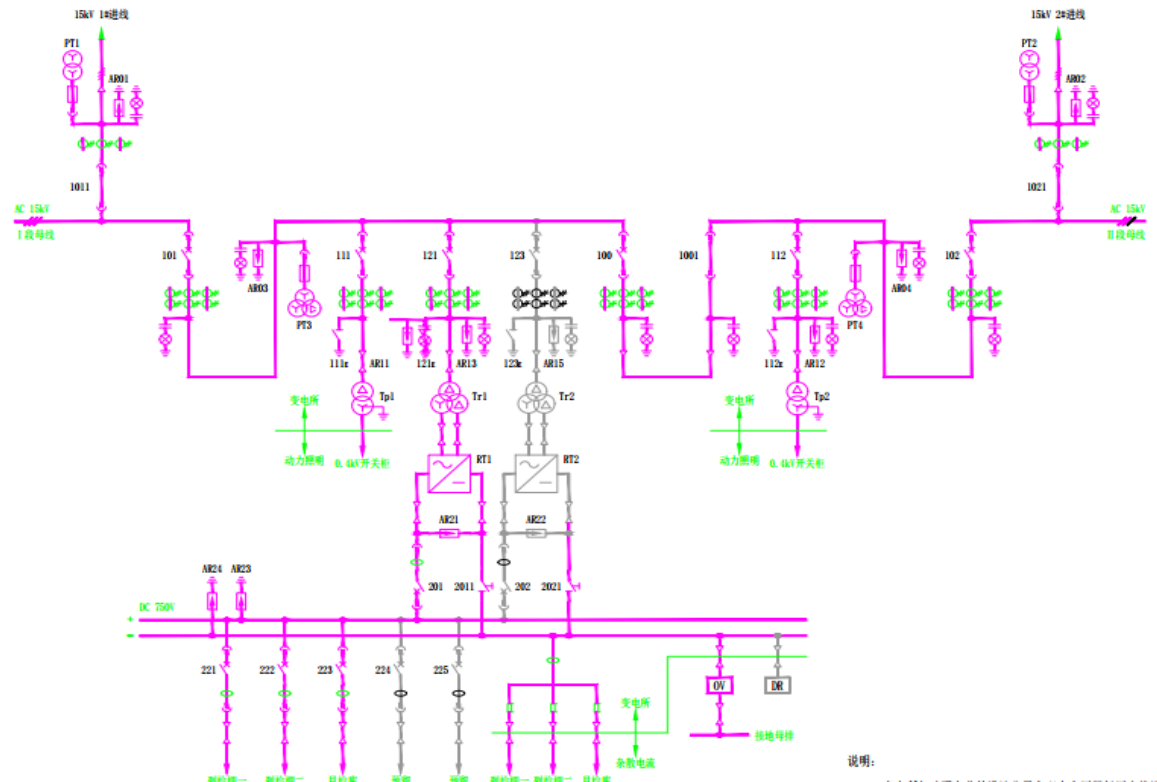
Typical AALRT traction power substation- rectifier substation layout
